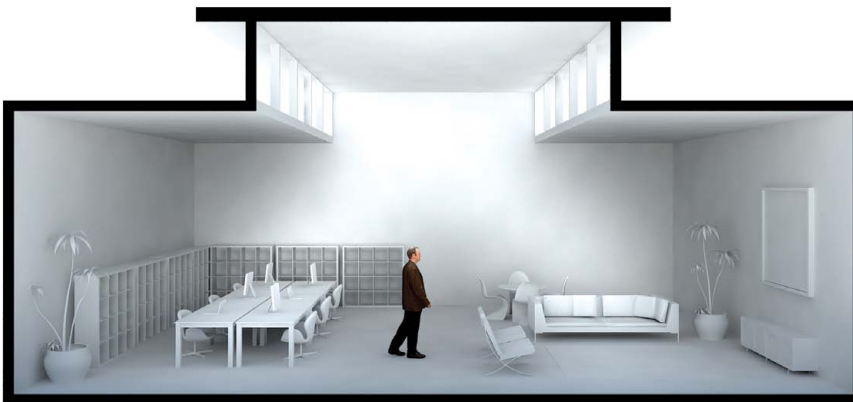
| TYPICAL ROOF MONITOR DAYLIGHT HARVESTING
